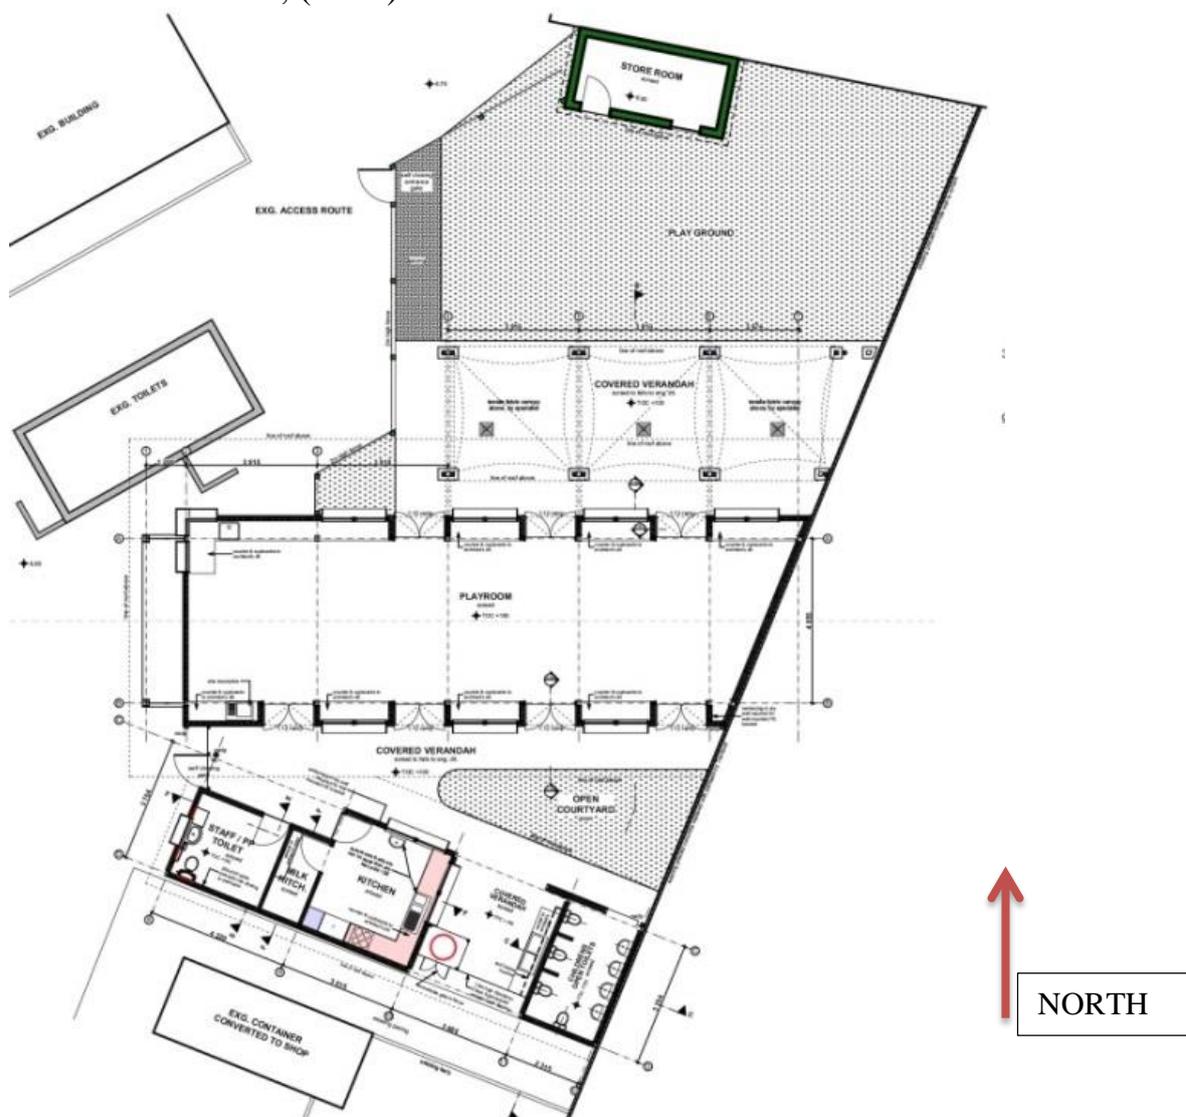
Qalakahle ECD Centre Plan (not to scale)
